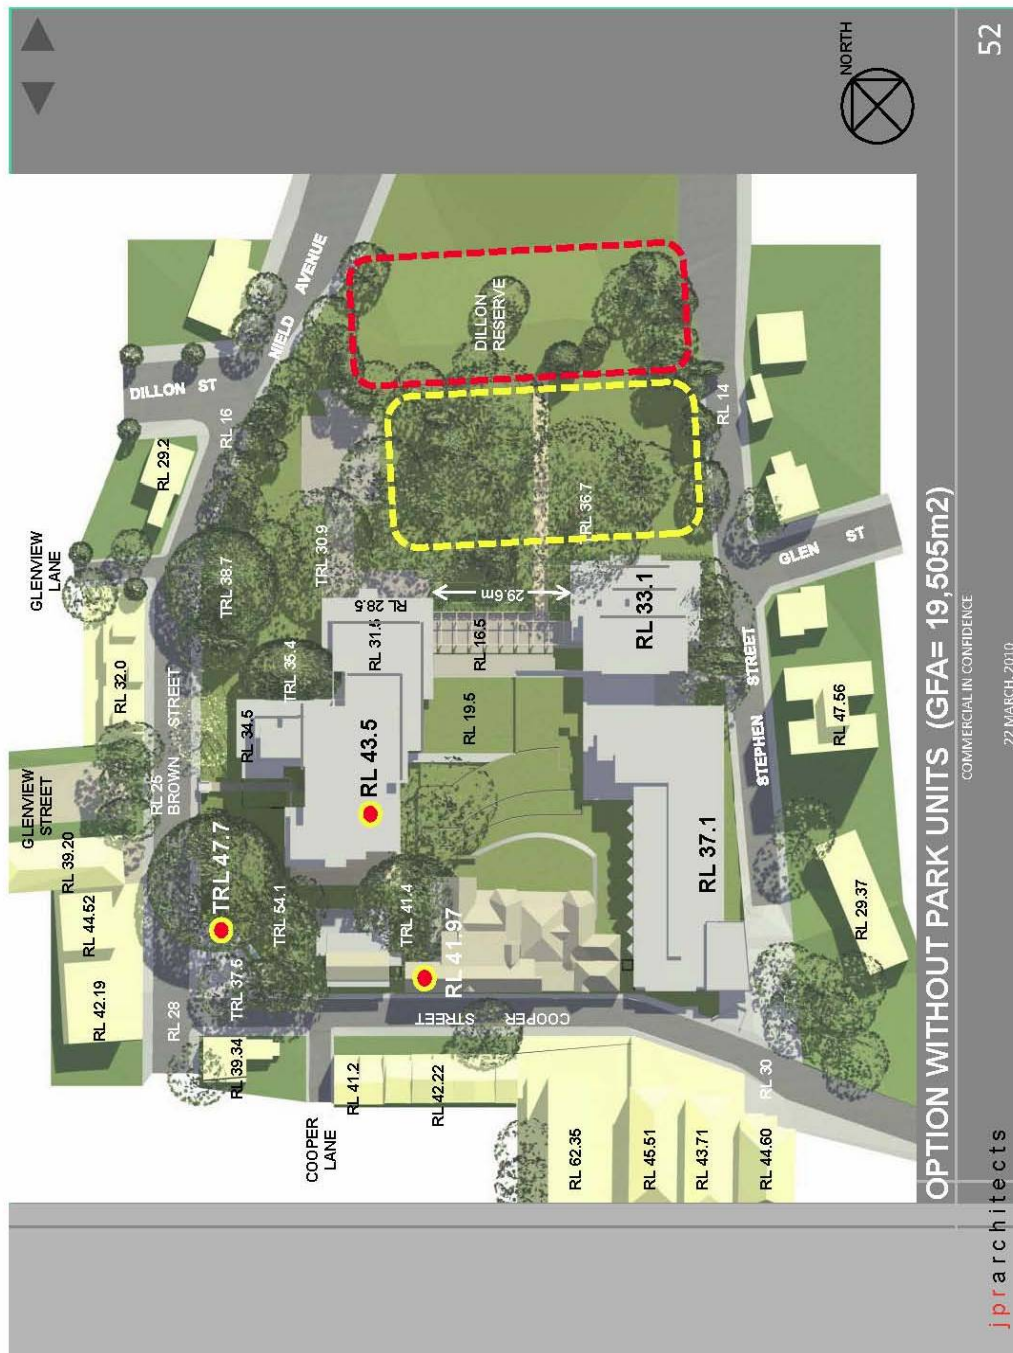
STAGE 1 MASTER PLAN OPTION 2
